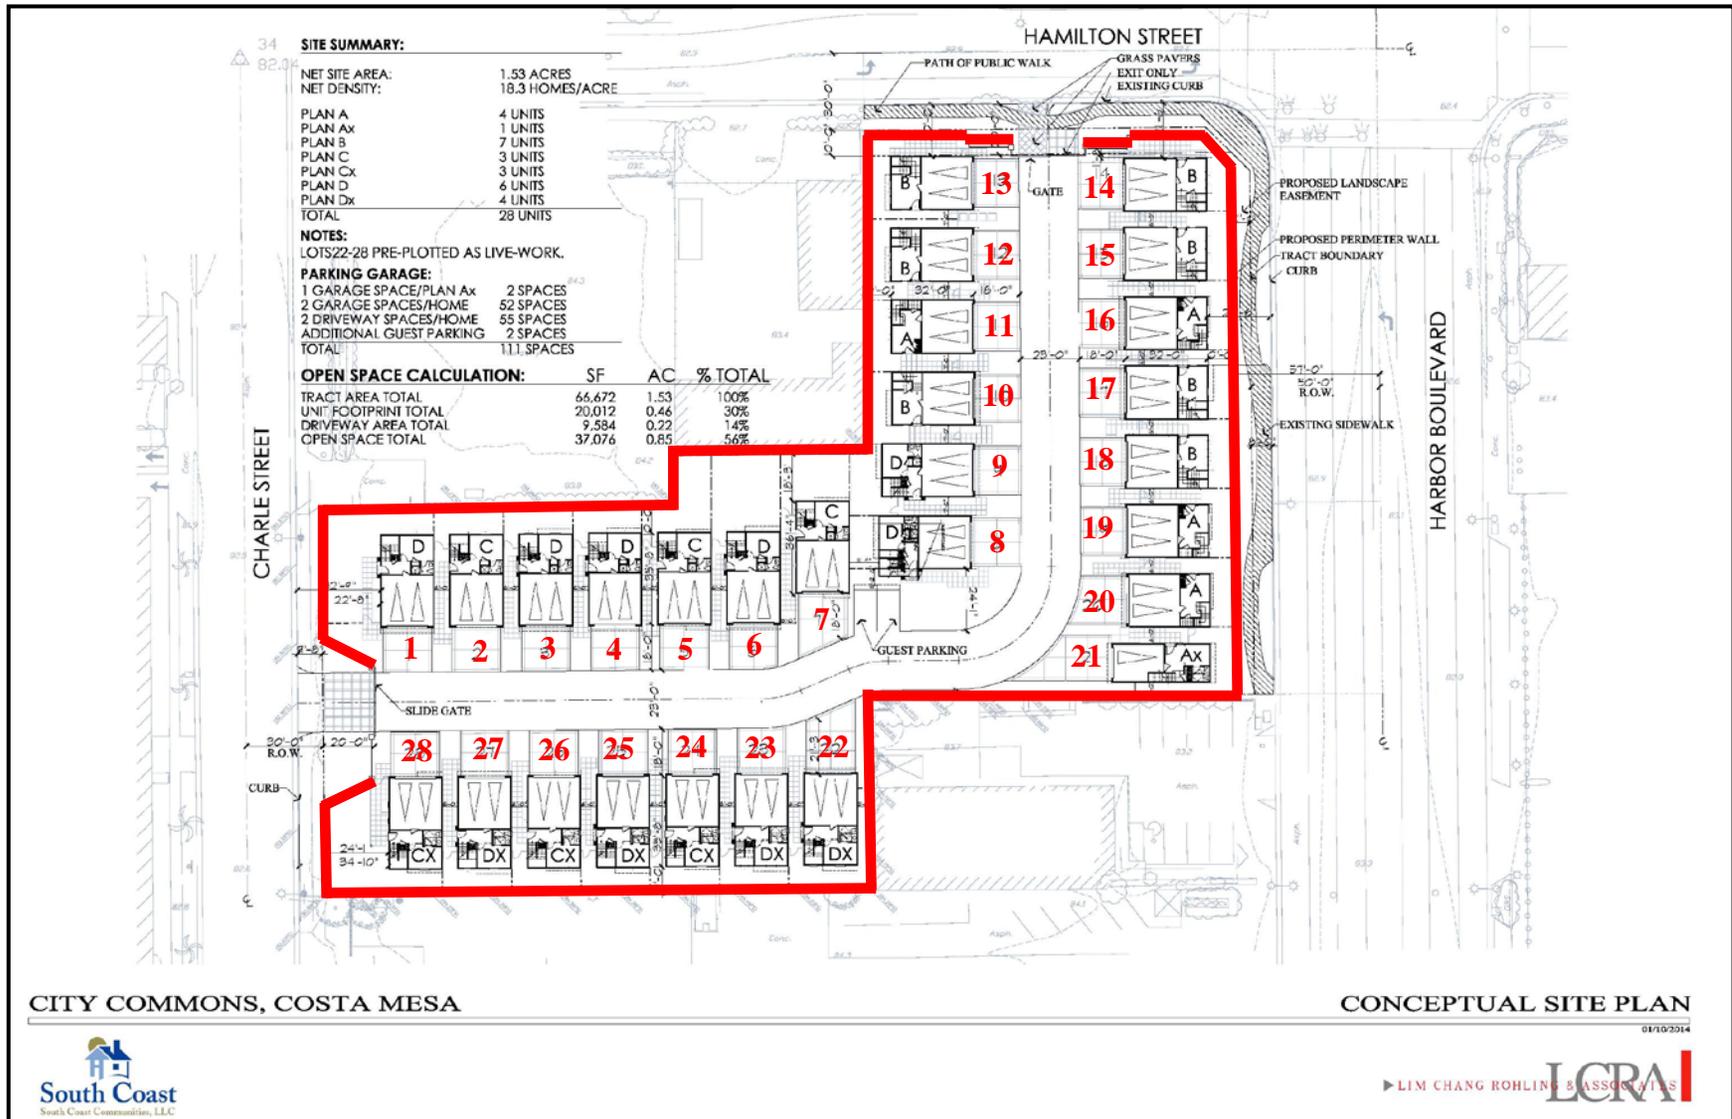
Location of the Planned 6-Foot Perimeter Walls
